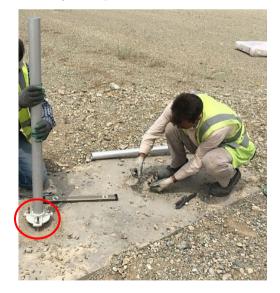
Installation (Assemble Aluminum Pipes on base plate)
